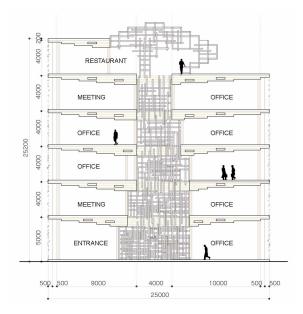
c - Section; Dimensions in [mm]
